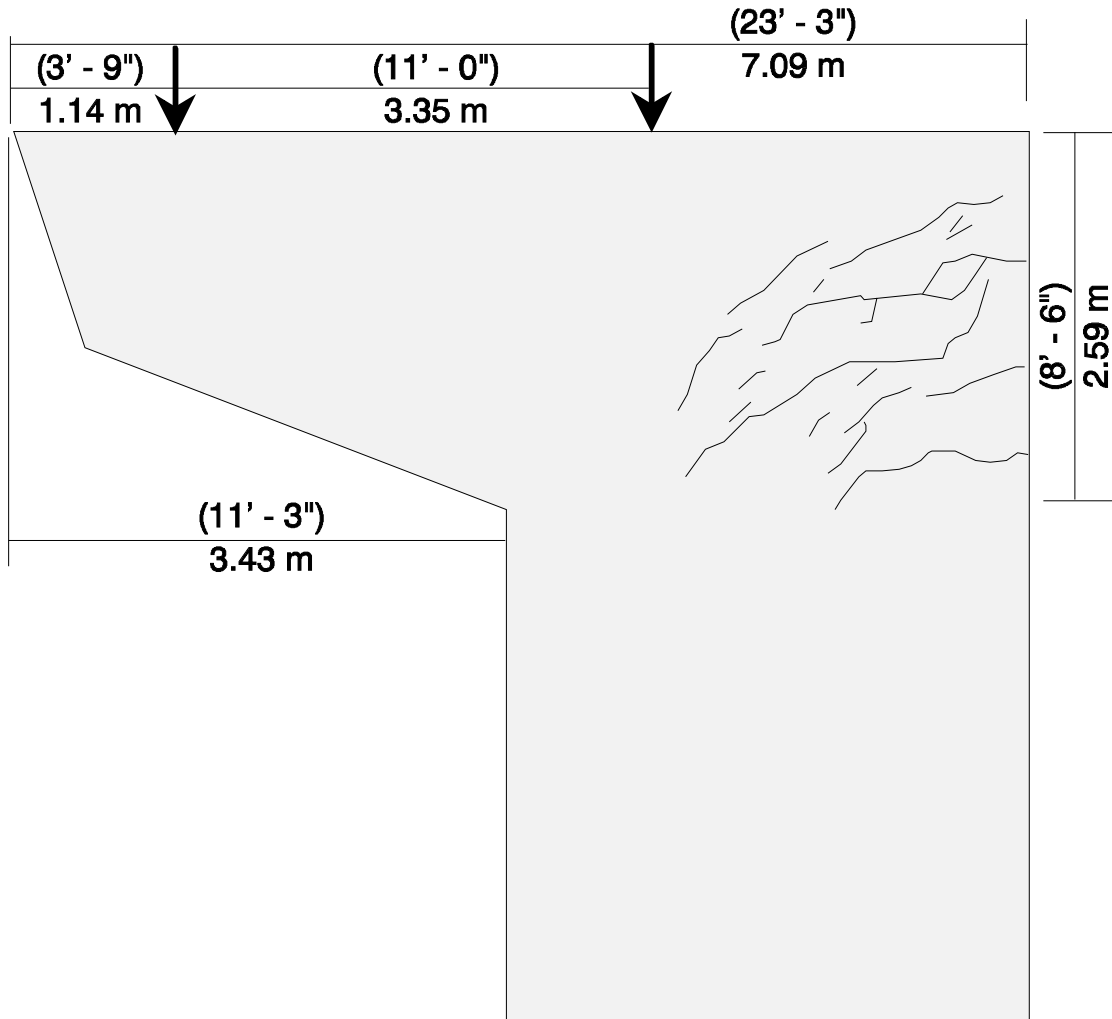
Pattern of Cracks in Pier D-37C
